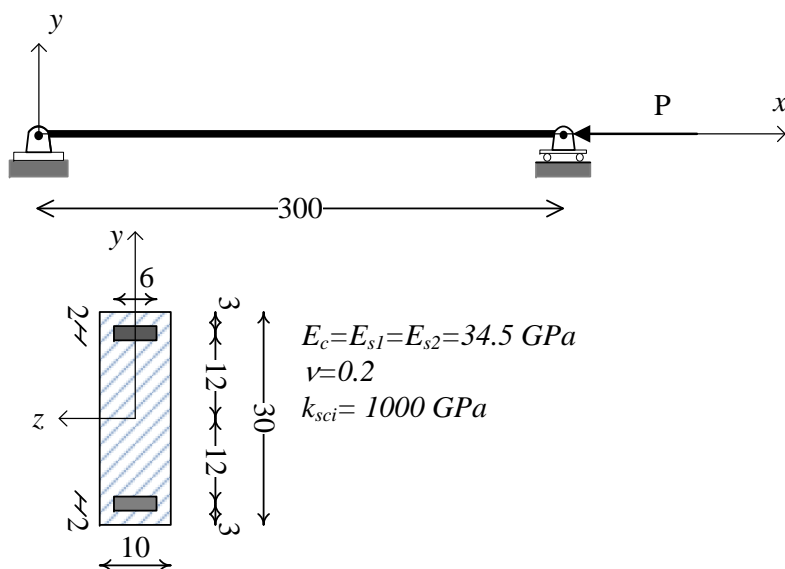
Buckling of a shear deformable column (dimension in [cm]).
